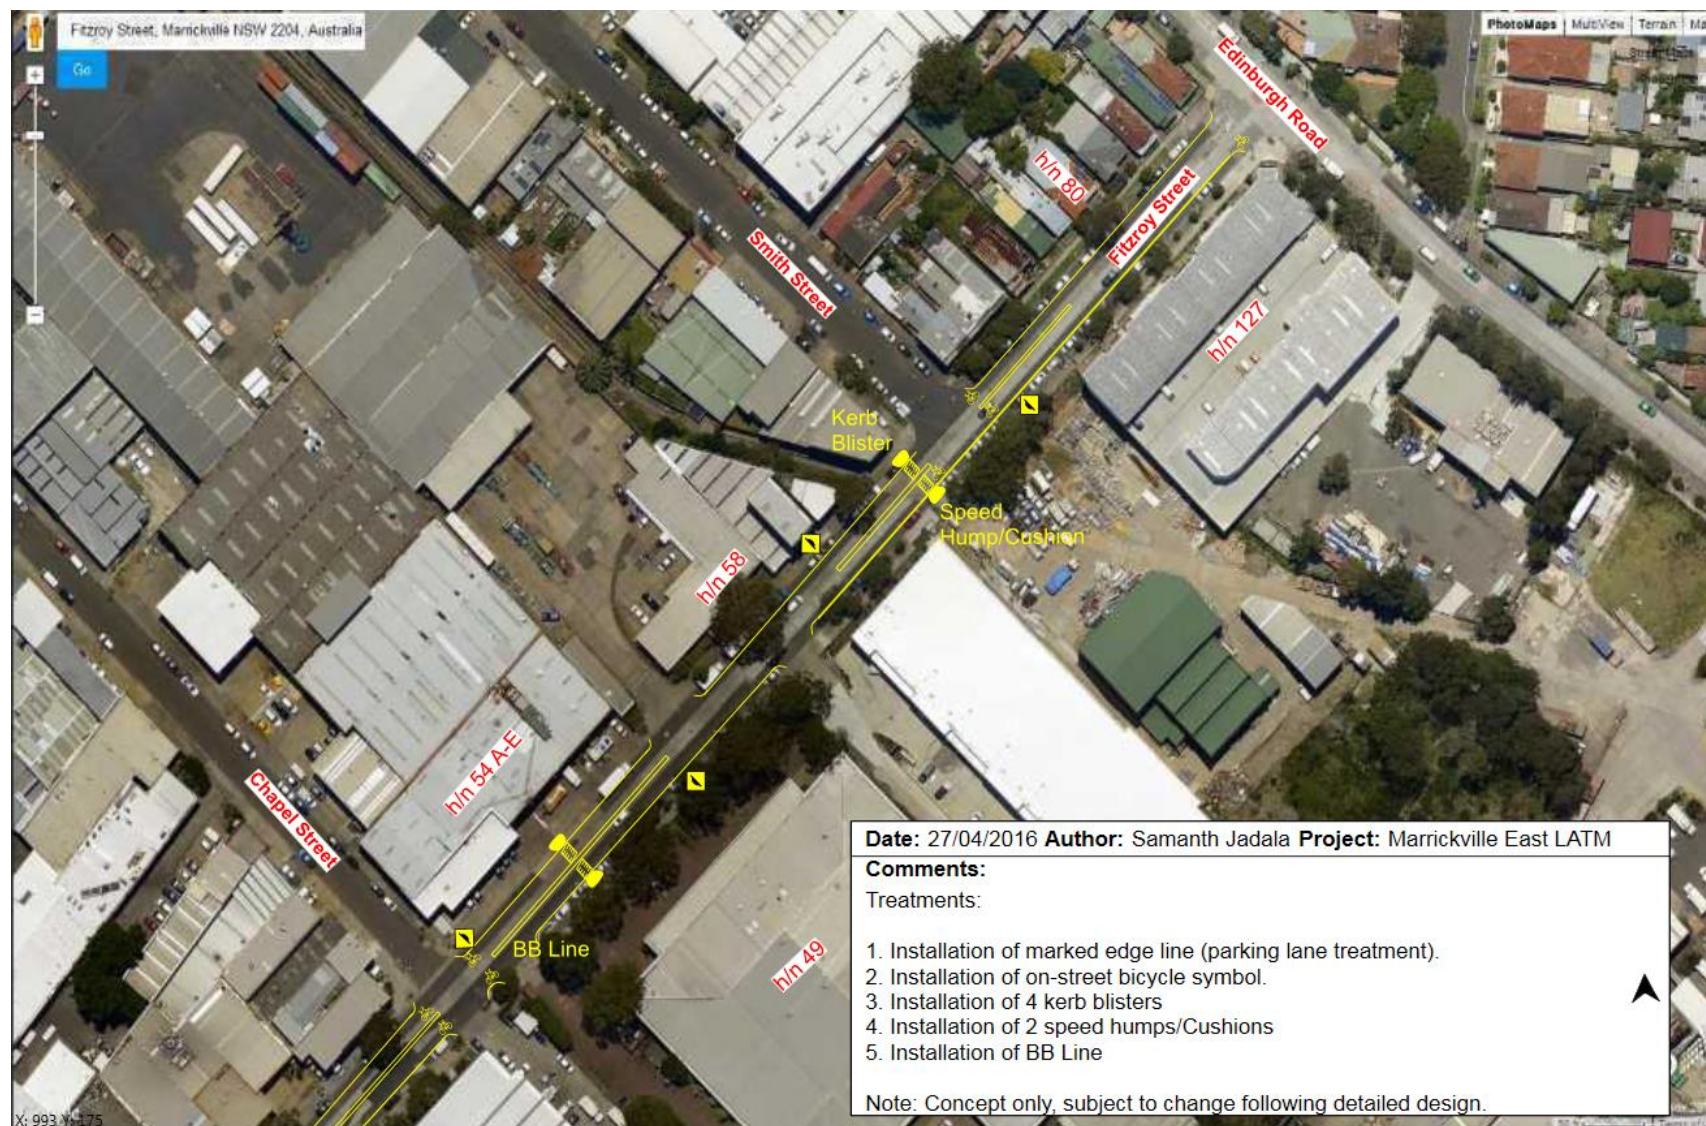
Item 1 - Fitzroy Street from Edinburgh road to Chapel Street
